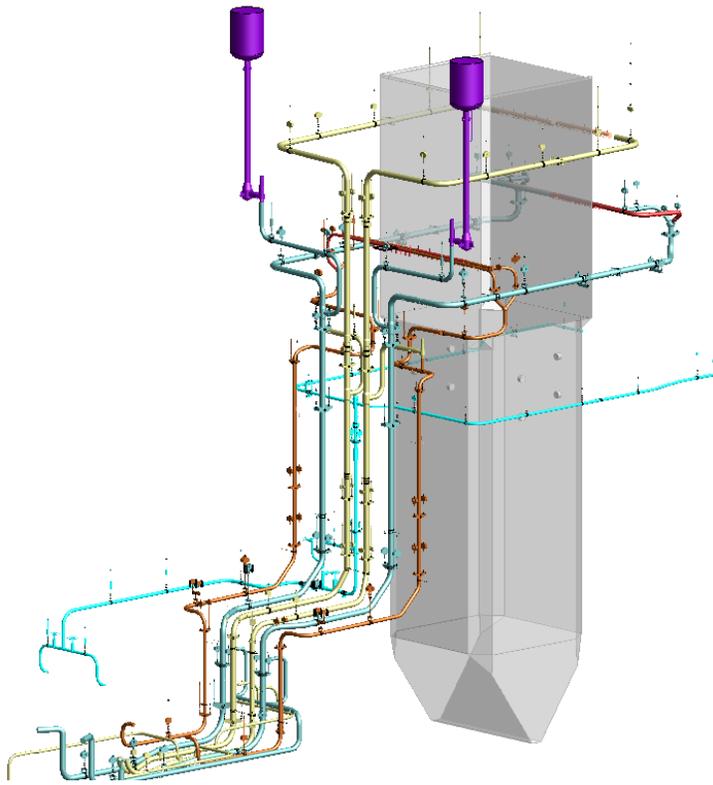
Layout HP piping Porto Tolle 3 x 660 MW
